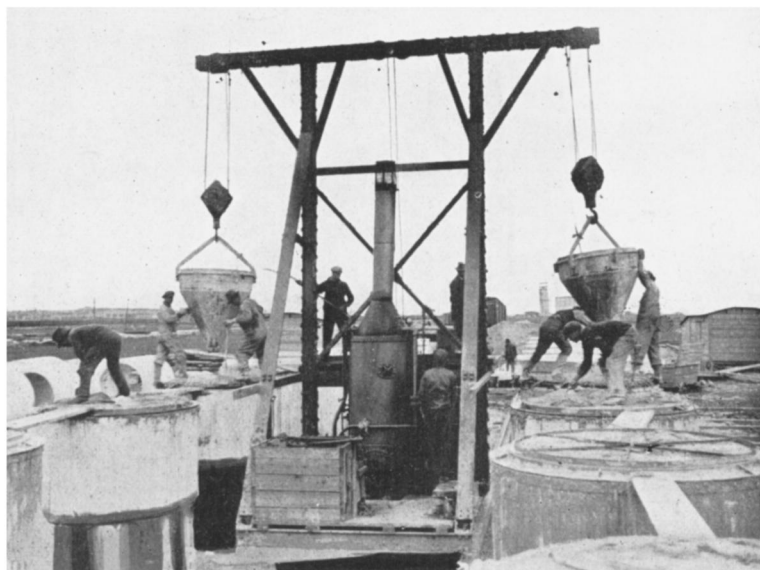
GANTRY DELIVERING CONCRETE TO FORMS FOR 66-INCH PIPE, CAST IN 8-FOOT LENGTHS WITH 8-INCH WALLS
